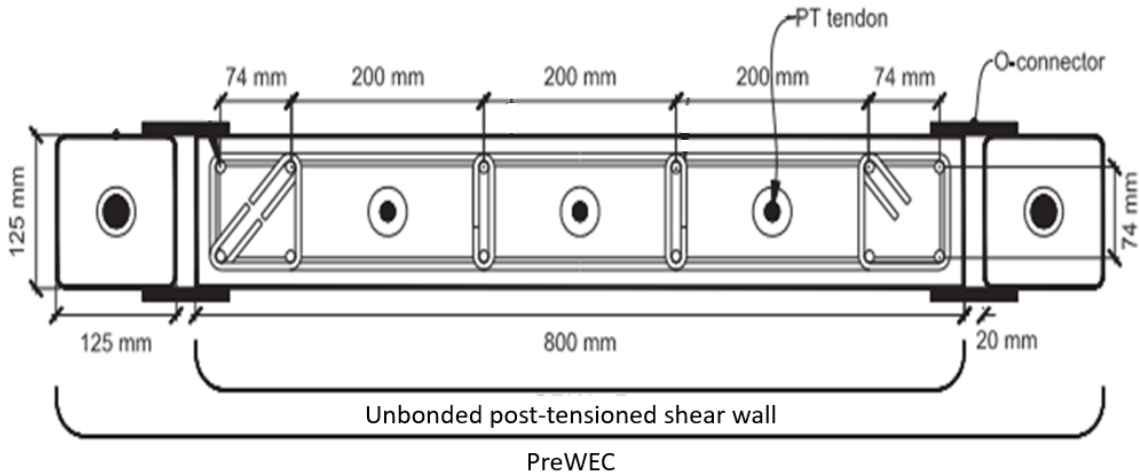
cross section of unbonded post-tension shear wall and PreWEC [32].
